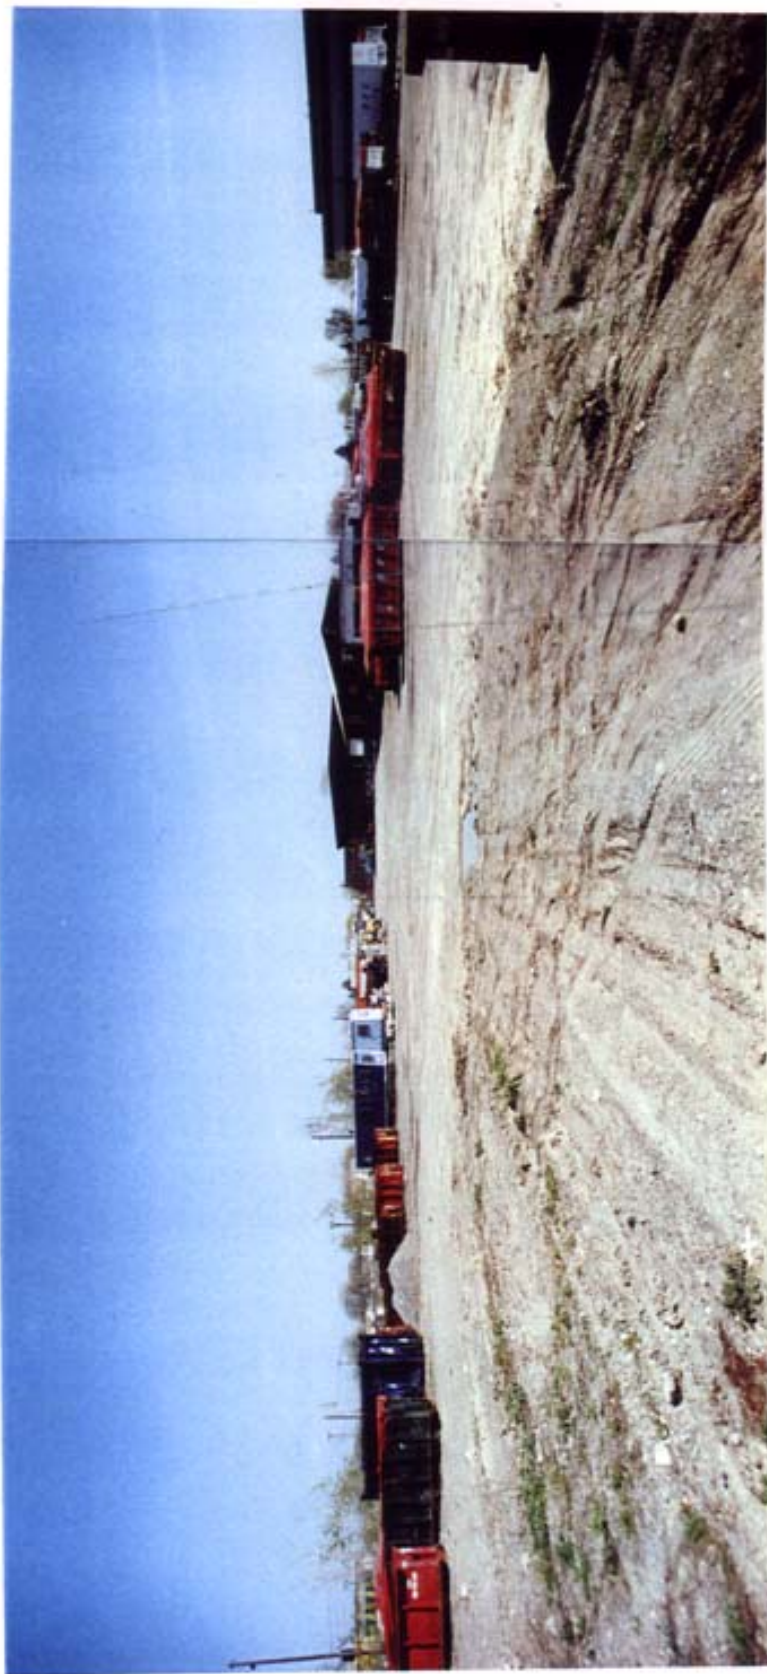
344 VULCAN STREET: Location of Former Farrel Birmingham Building Showing Highly Disturbed Conditions, Facing South. (Note: Water-filled feature in foreground is Former Footing For Heavy Machinery.)
